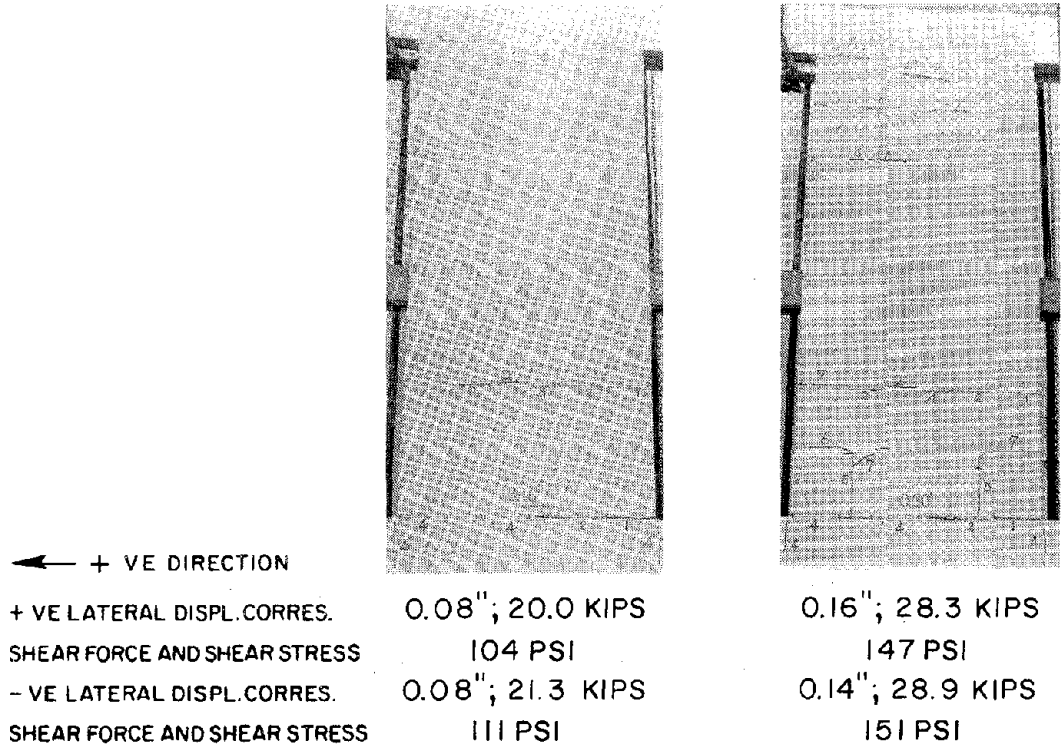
SUCCESSIVE CRACK FORMATION TEST 15. (RIGHT SIDE PIER)
